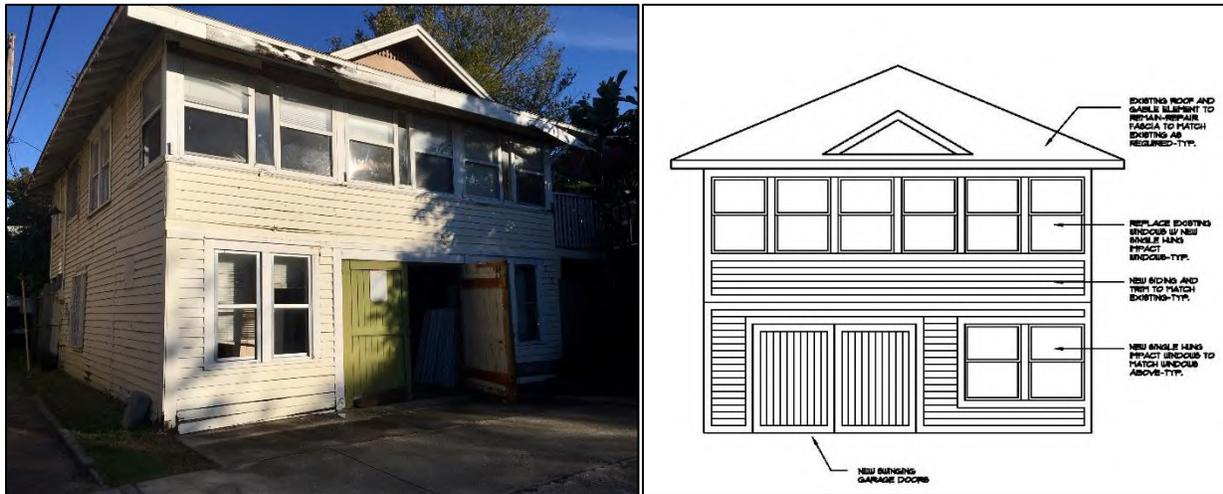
Existing garage apartment on left. Proposed elevation on right.
